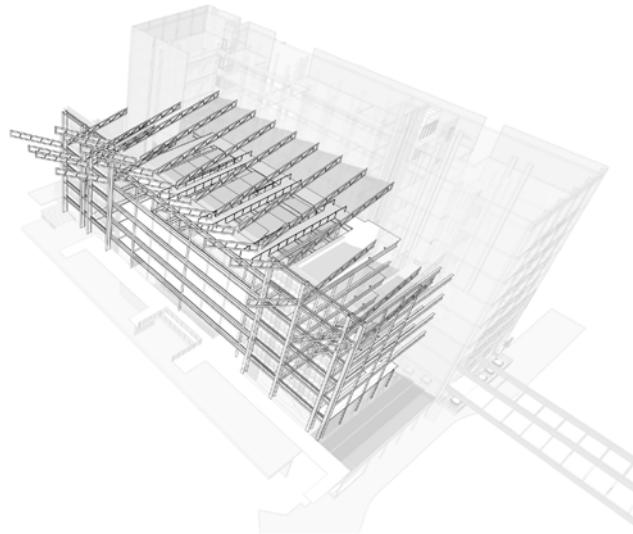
Roof structure: the primary structure supports the roof truss structure.
